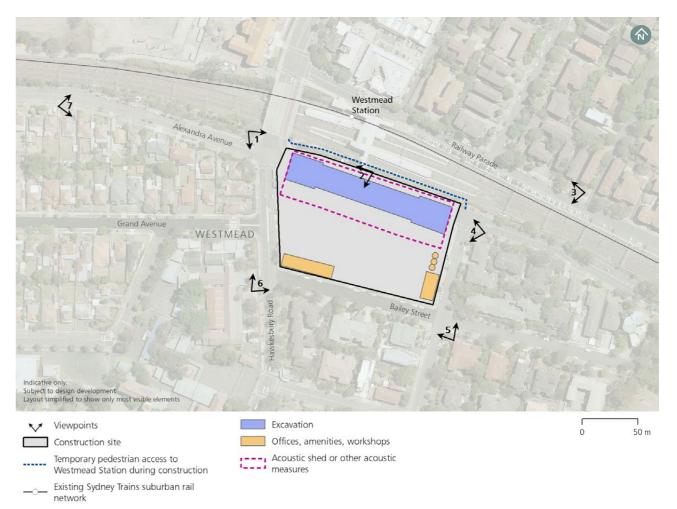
Westmead metro station construction site - Representative viewpoints
